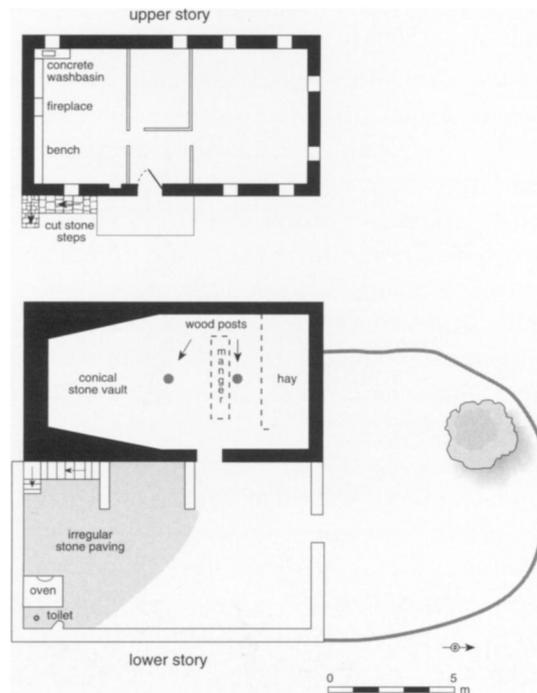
Plan of a four-room *anogokatogo*-style house, structure 1035. R. J. Robertson
